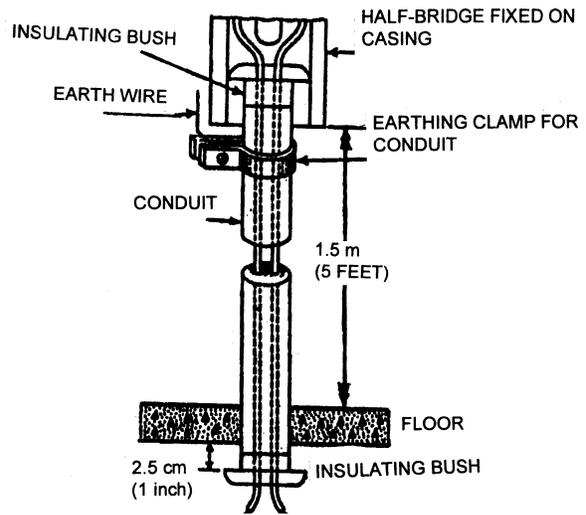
LEADING OF CABLE THROUGH THE FLOOR
